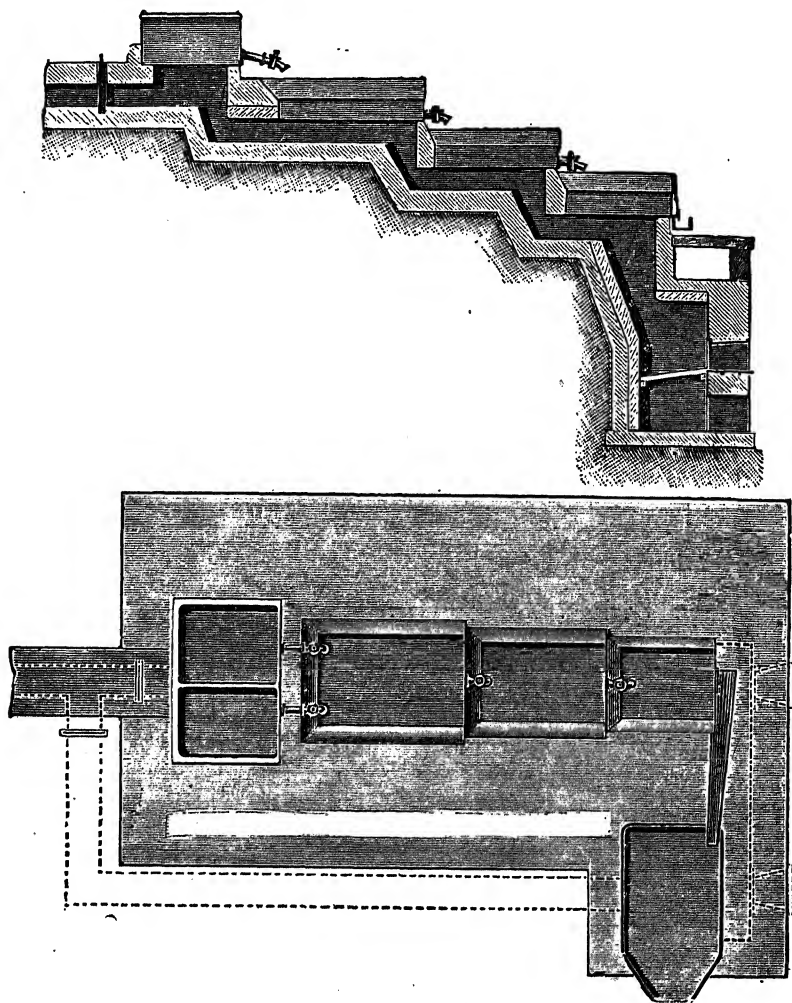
Plan and longitudinal section of a terrace battery of open under-fired evaporating pans.
